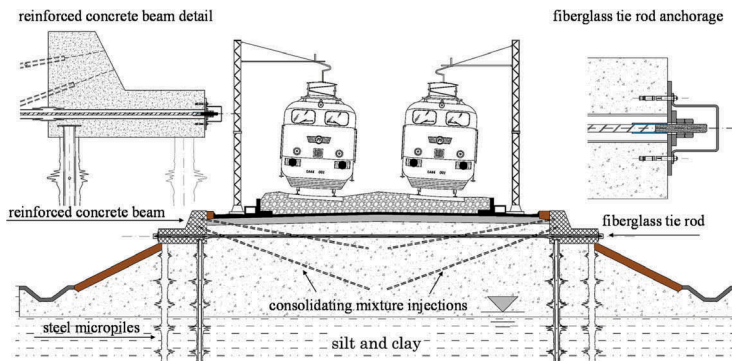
Typology section of the geotechnical structure with detail of reinforced concrete beams, injections of consolidating mixture and anchoring system with composite tie rods.
